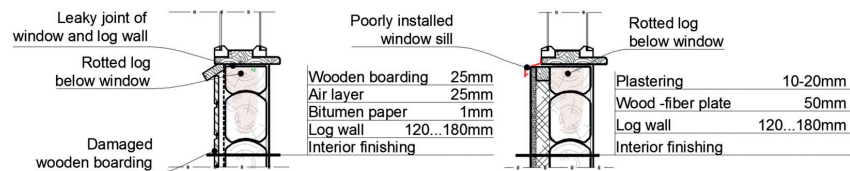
Typical external wall with wooden boarding (left) and plastering (right).
